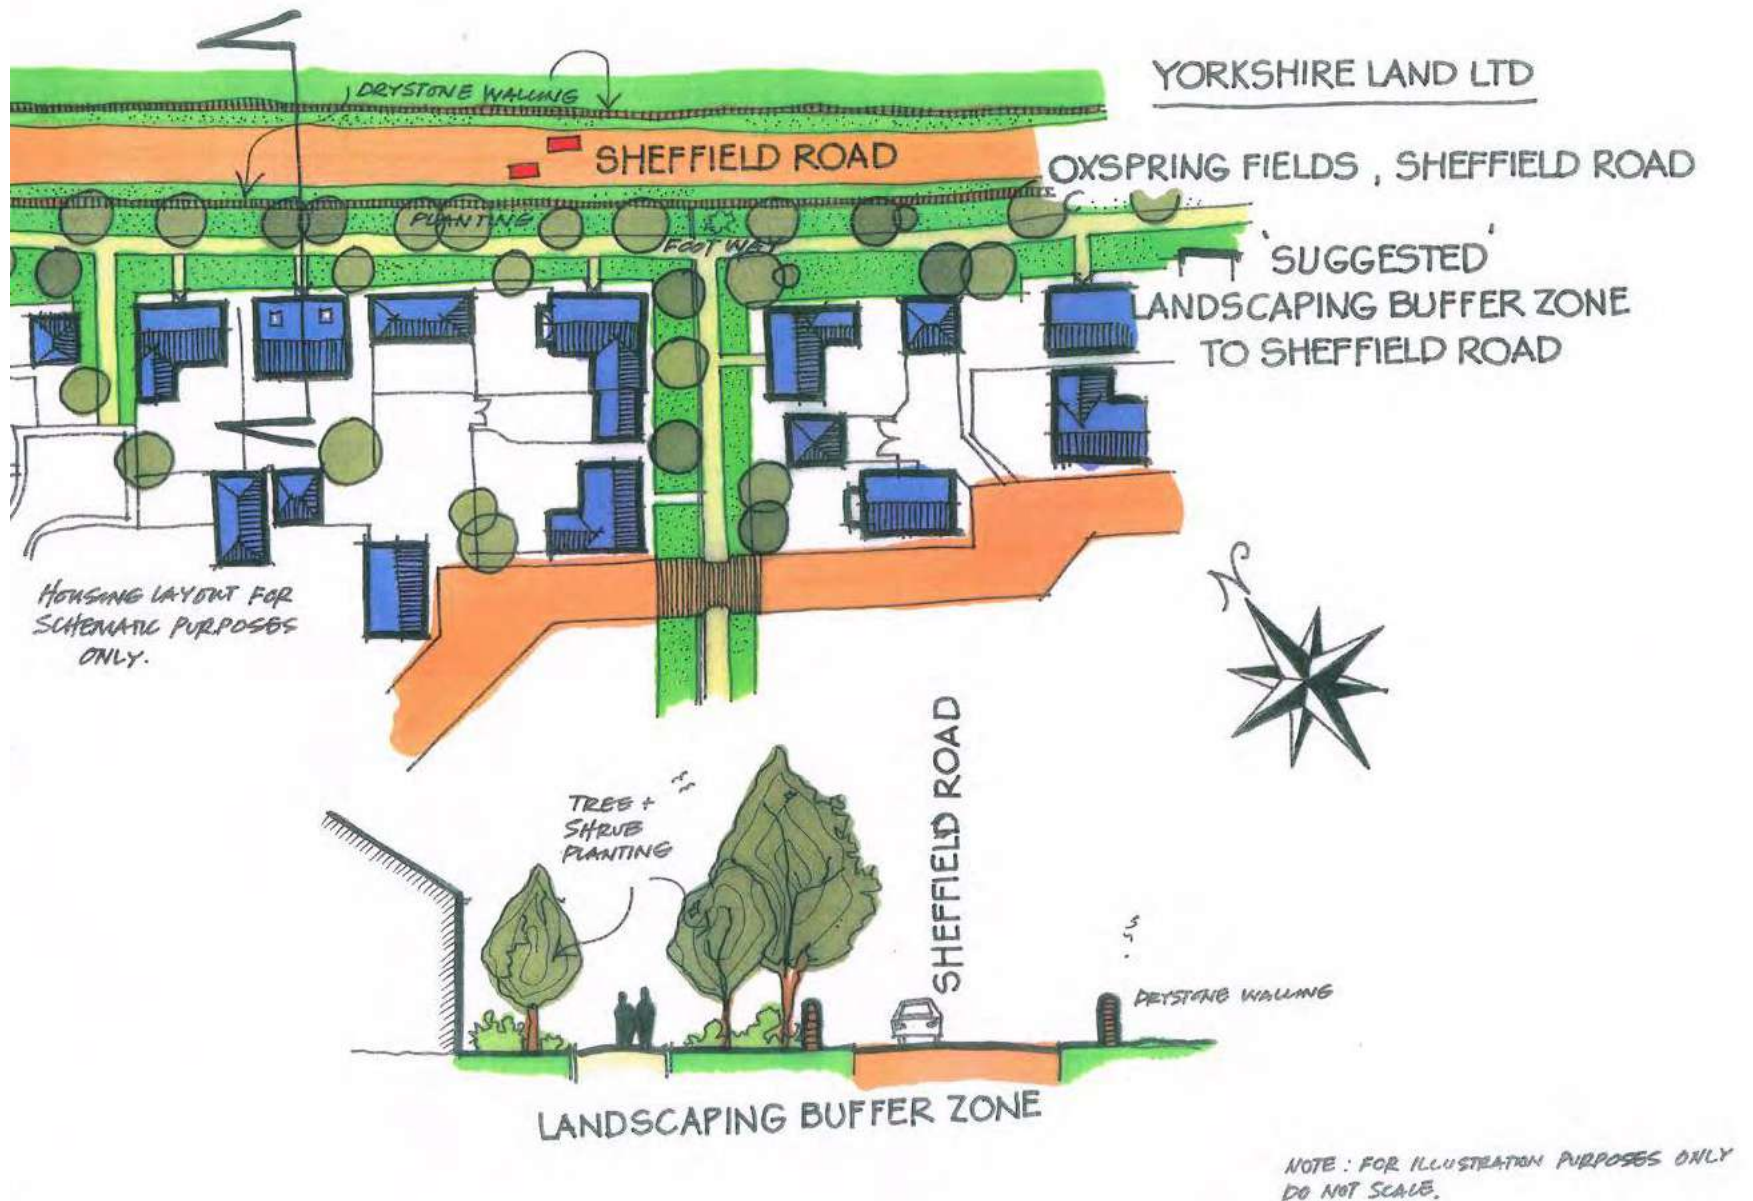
Fig B: Proposed buffer zone and entrance adjacent to Sheffield Road
